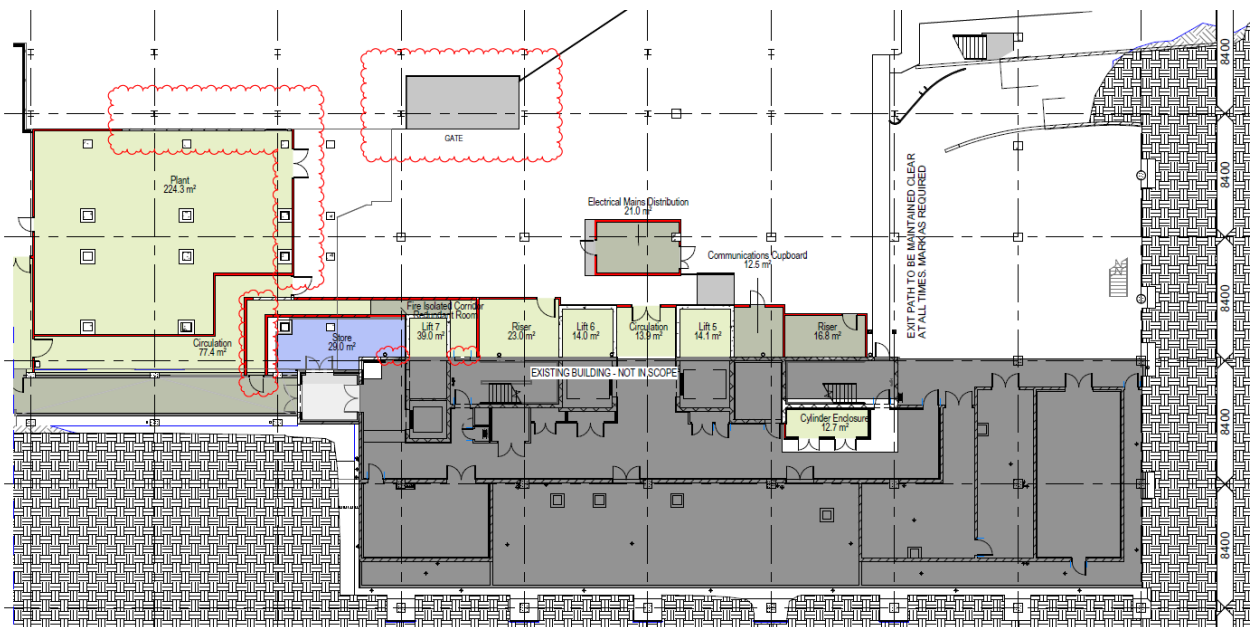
Proposed Amended Level 3 Plan (Source: CGA)
